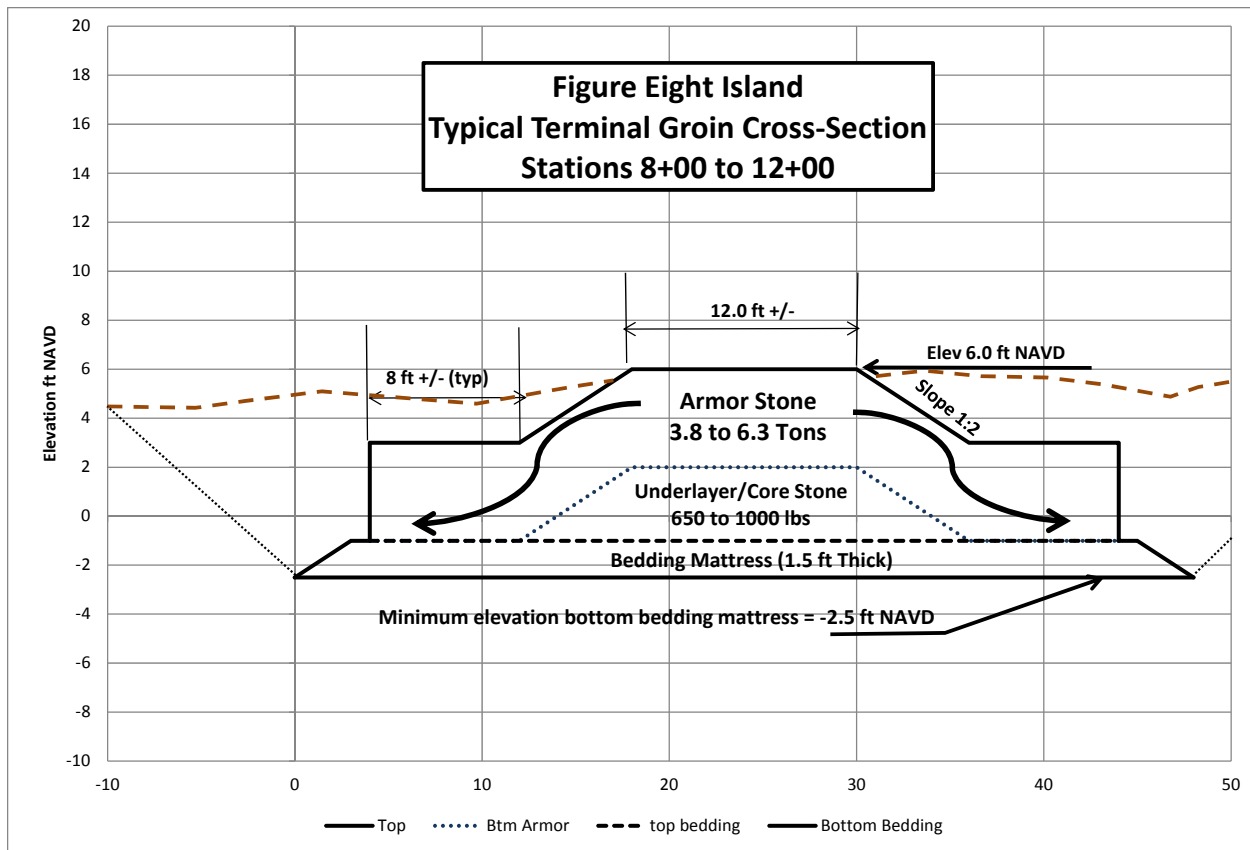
Typical Terminal Groin Cross-Section 1.
